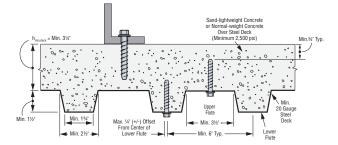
Installation of %" Diameter Anchors in the Topside and ¼" Diameter Anchors in the Soffit of Concrete over Metal Deck
